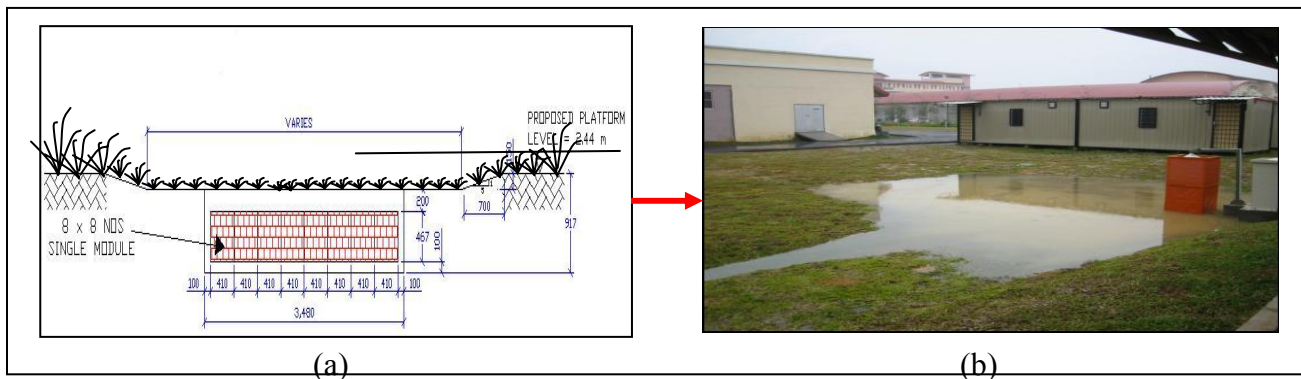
Typical Cross Section of A Dry Pond: (a) Cross Section and (b) Monitoring Station
